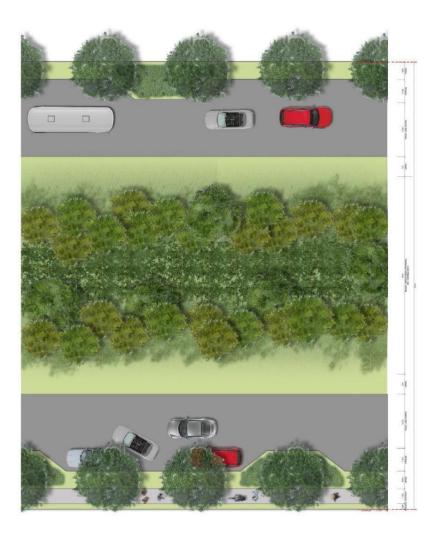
Avenue 2 plan Note: all dimensions are indicative only and subject to confirmation at DA stage
